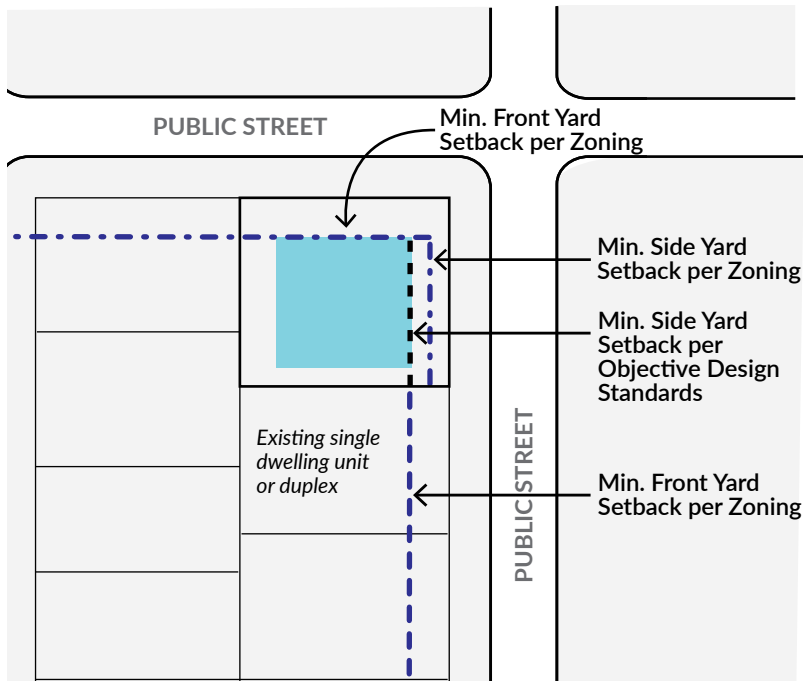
Front yard setbacks adjacent to single dwelling units on a corner lot.
